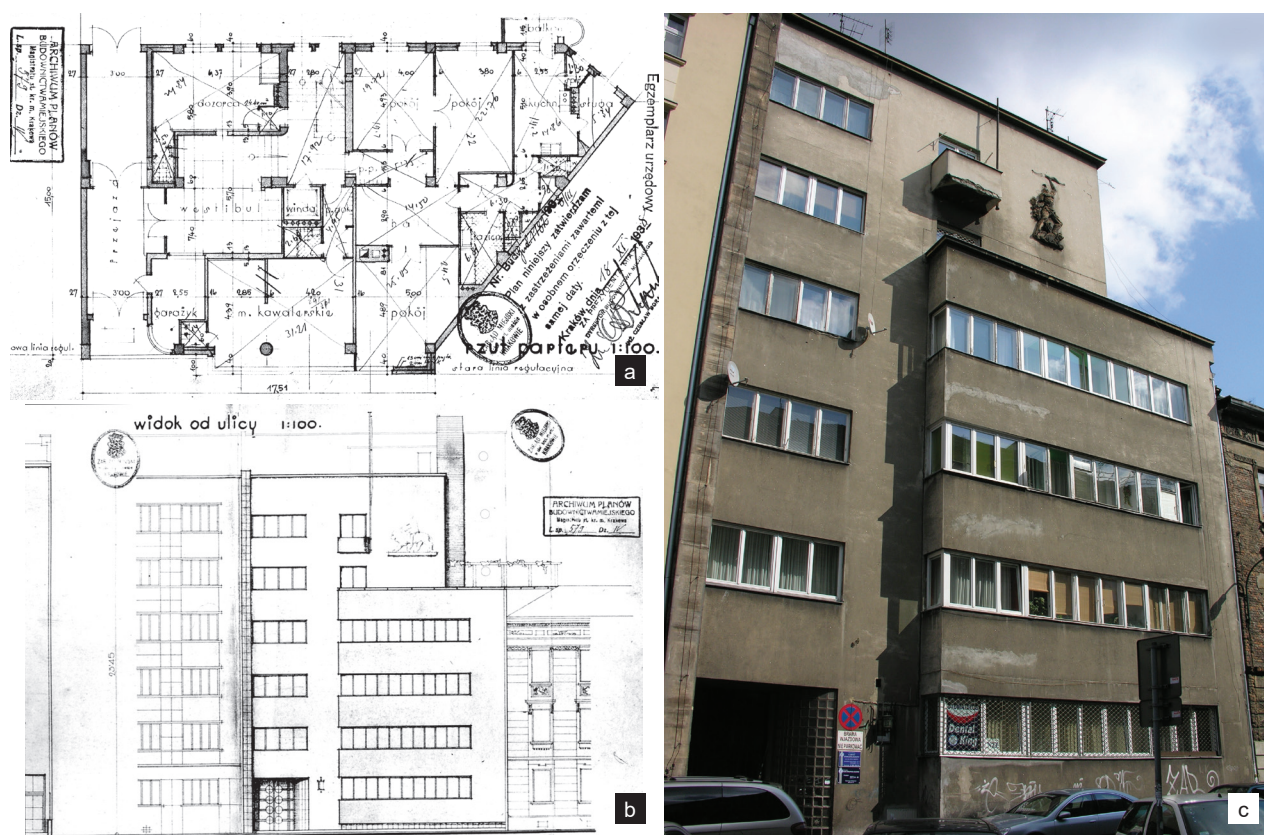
Tenement at 13 Lenartowicza Street: a) the ground floor plan (source: ANK, ABM, 13 Lenartowicza Street, fasc. 491), b) façade (source: ANK, ABM, 13 Lenartowicza Street, fasc. 491), c) front façade (photo by B. Makowska)
